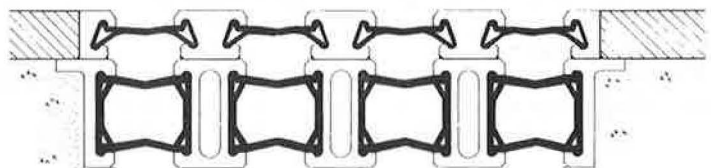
Using strip seal component to elevate existing systems for new overlay.
